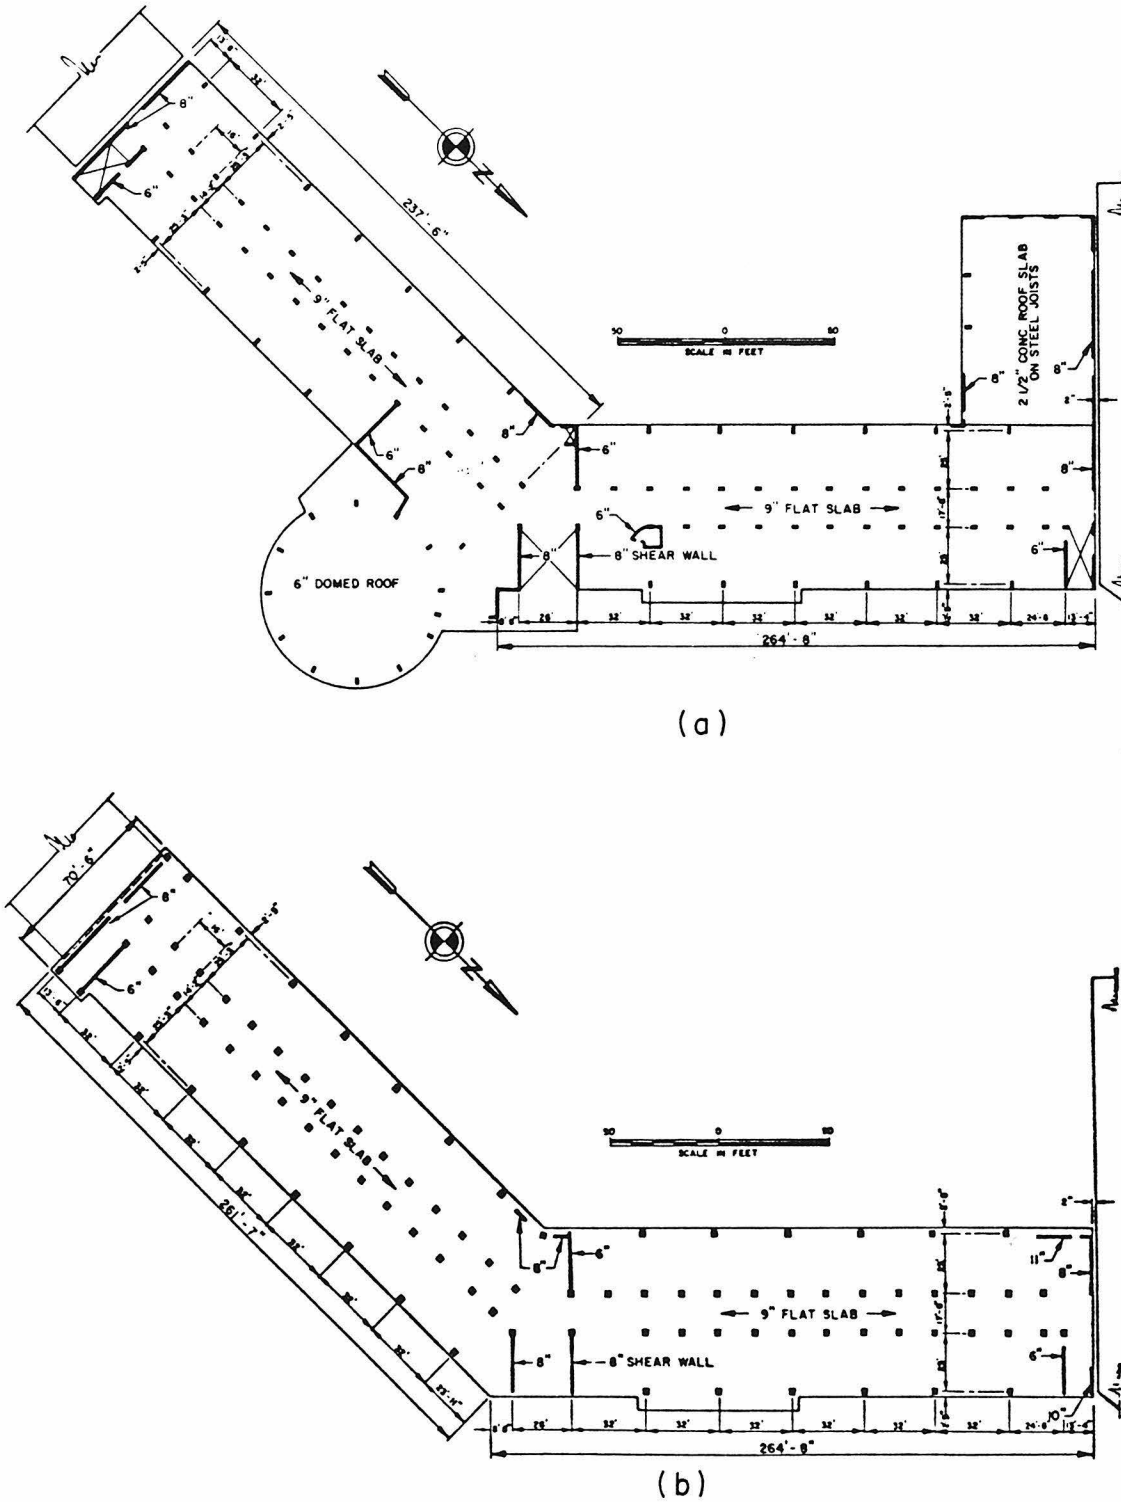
FRAMING PLANS OF WEST ANCHORAGE HIGH SCHOOL BUILDING (from George, et al., 1973). (a) FIRST FLOOR PLAN. (b) SECOND FLOOR PLAN.
